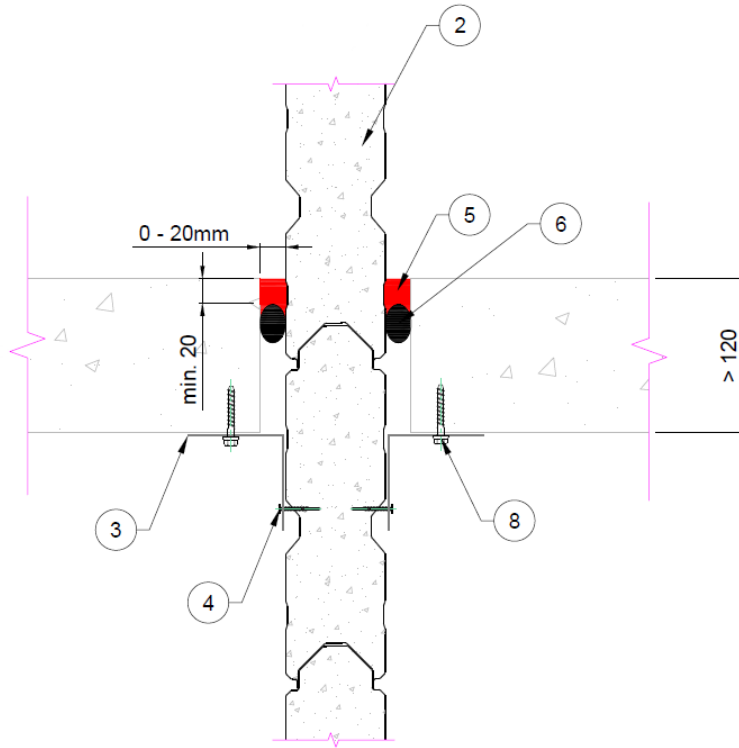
Wall-to-stair Joint (0-20 mm gap)
